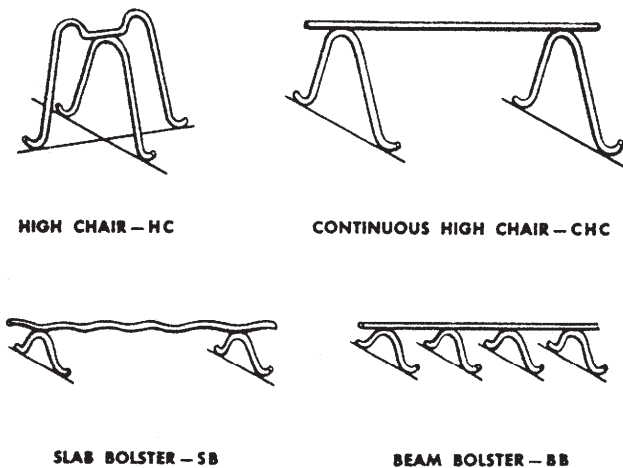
Devices used to support horizontal reinforcing bars.
